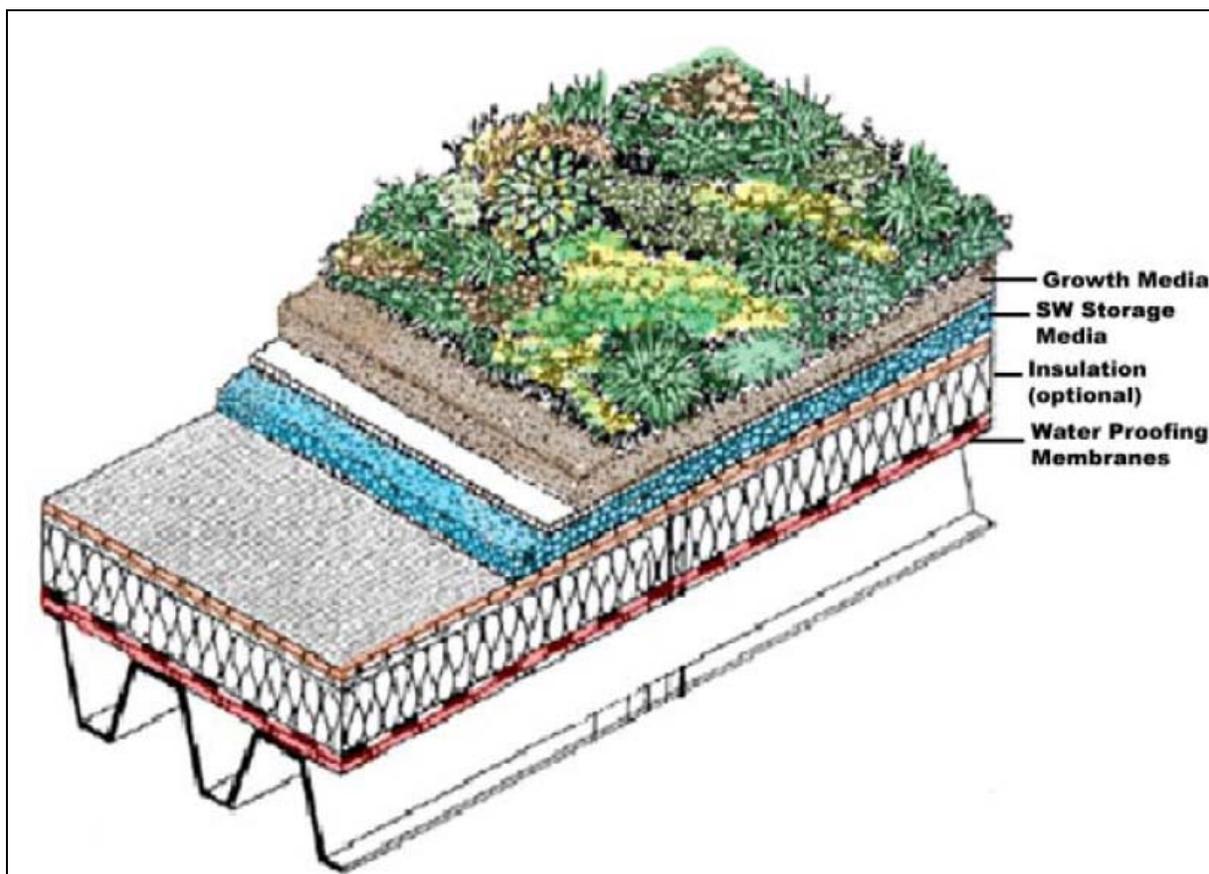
Vegetated Roof Schematic (Roofscapes, Inc.)
